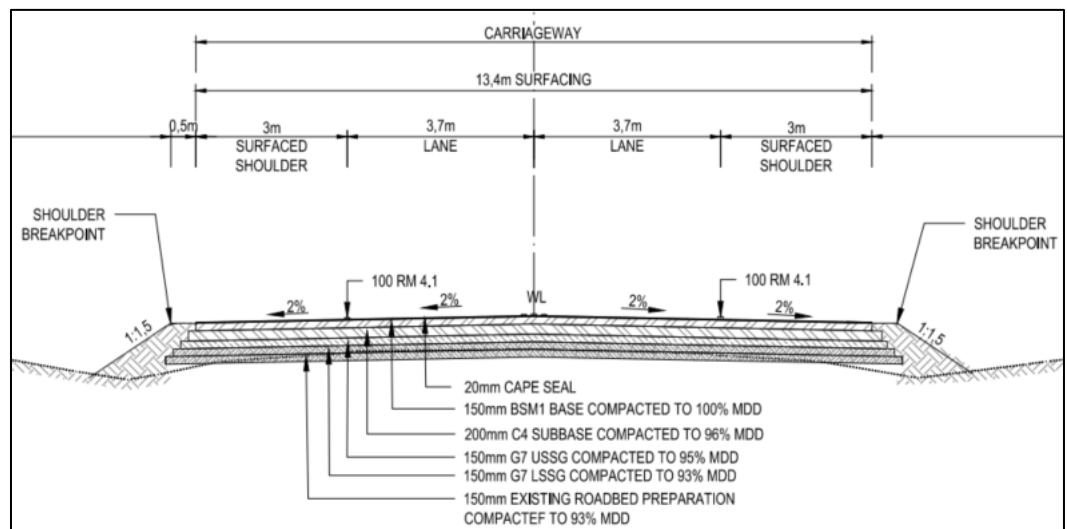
Typical Cross section from km 7.9 to km 14.2 and km 16.6 to km 23.0
